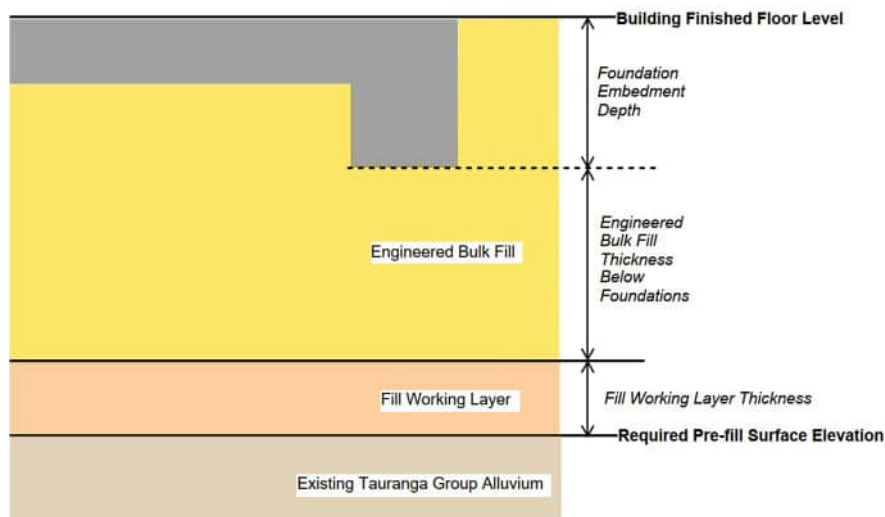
Schematic of Shallow Ground Improvement Beneath Shallow Foundations
